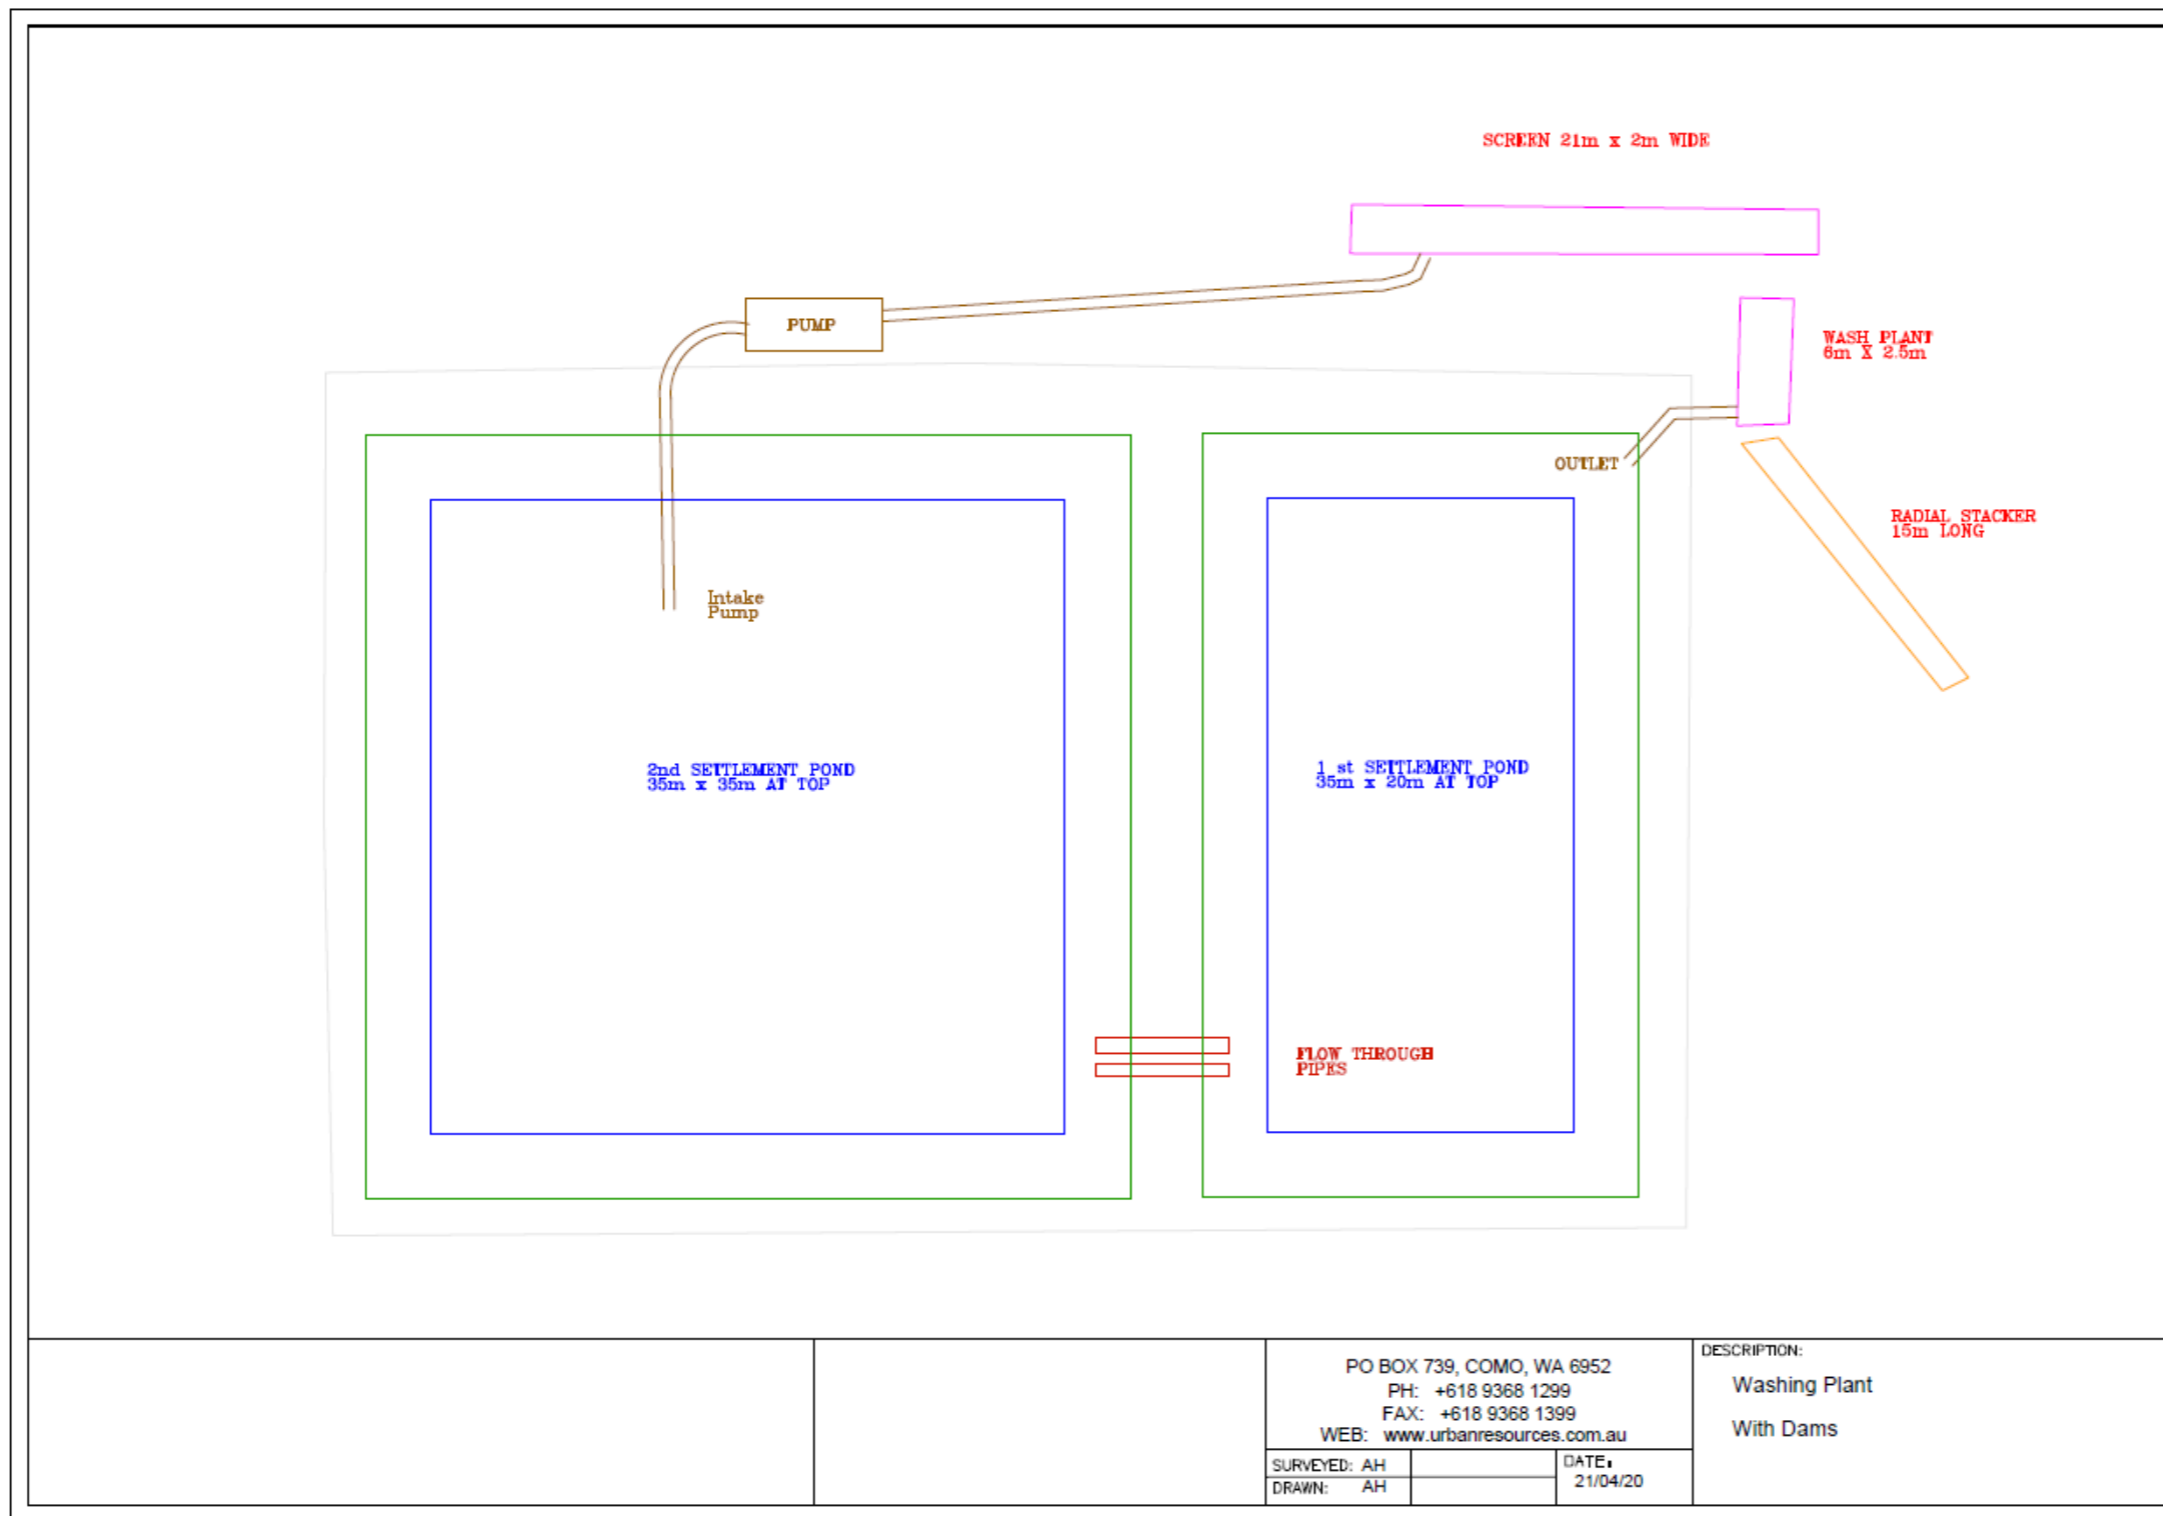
Wash plant and settlement pond design *Source: figure provided by applicant
